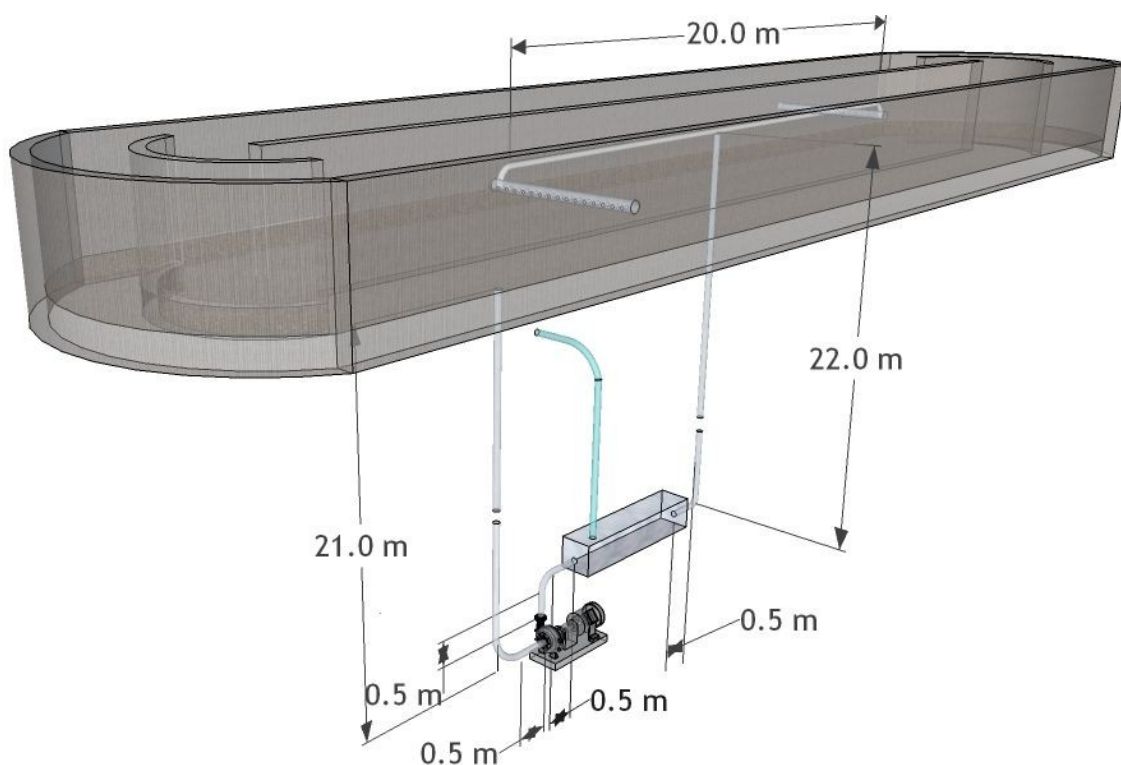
Schematic layout of the wastewater piping system in the oxidation ditch.
